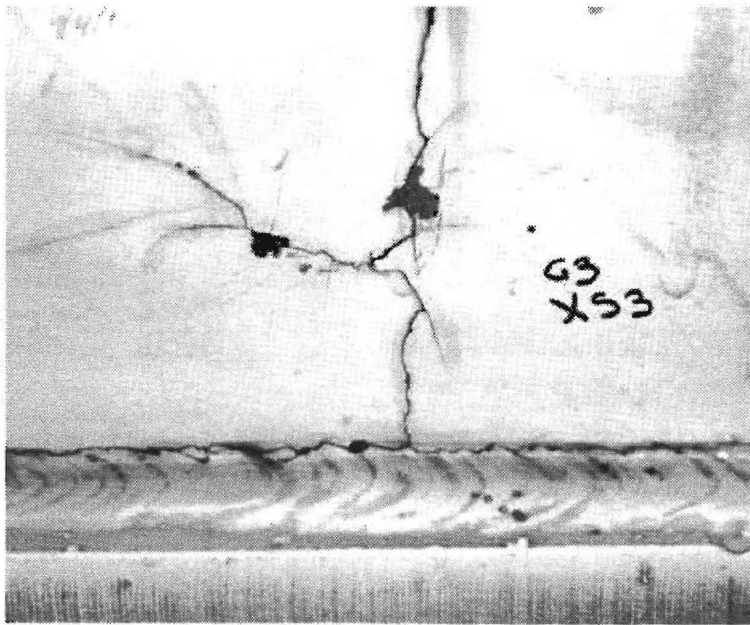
View of irregular web-to-flange fillet weld toe.
